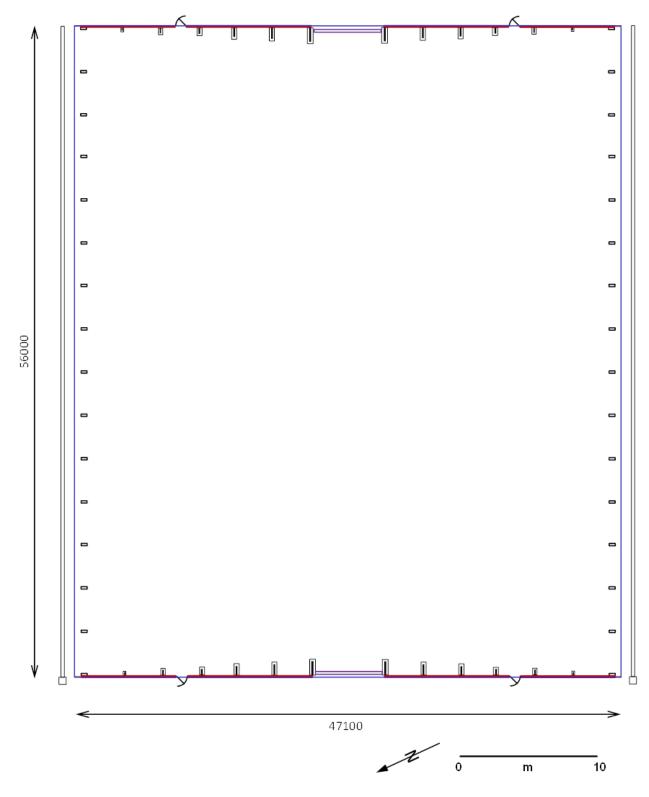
Plan of CUST Hut, showing external drains, wall and roof supports
